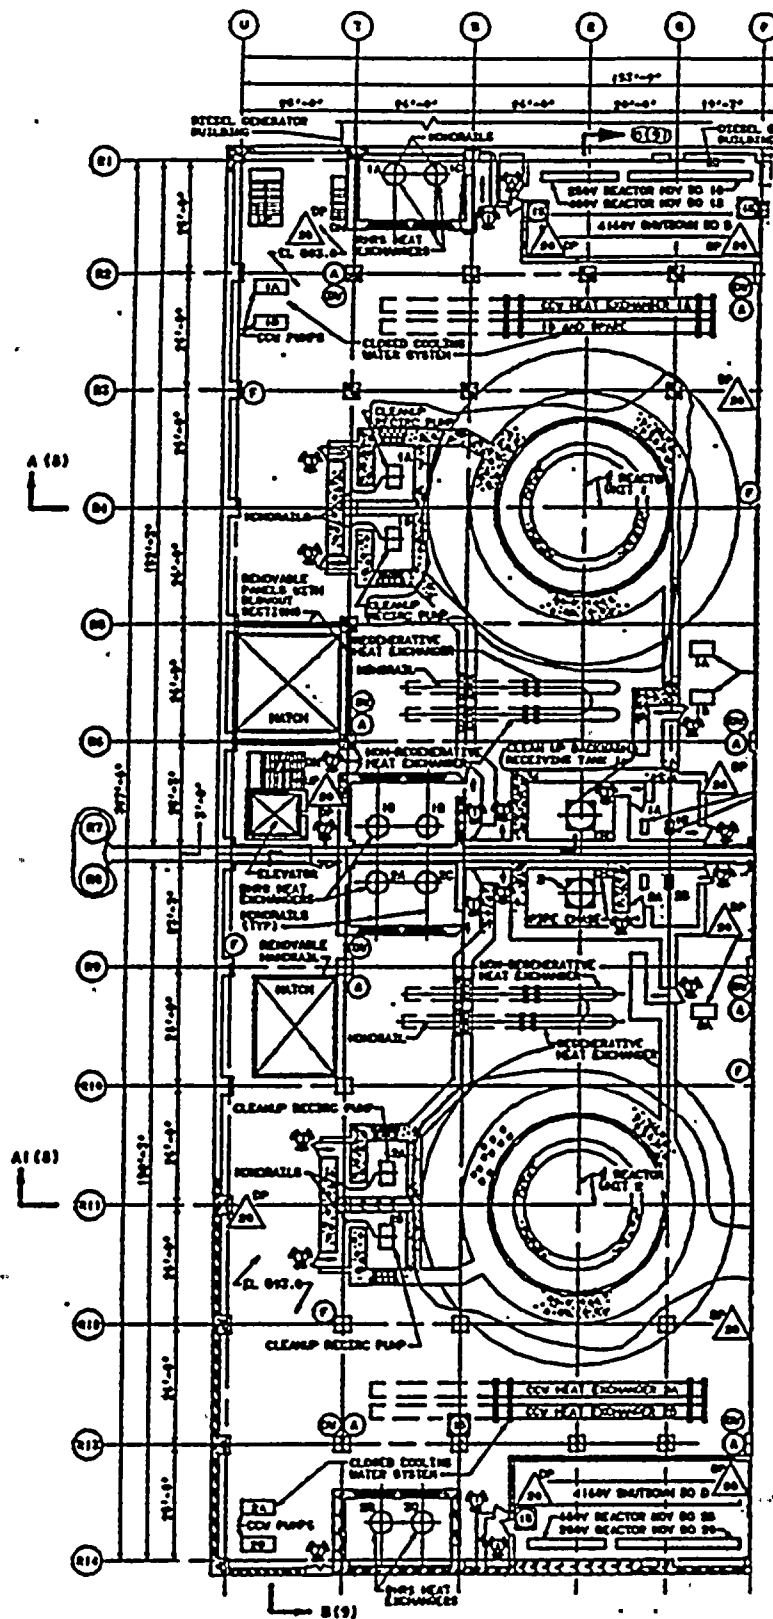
(Page 1 of 2). Reactor Building, Elevation 593'
